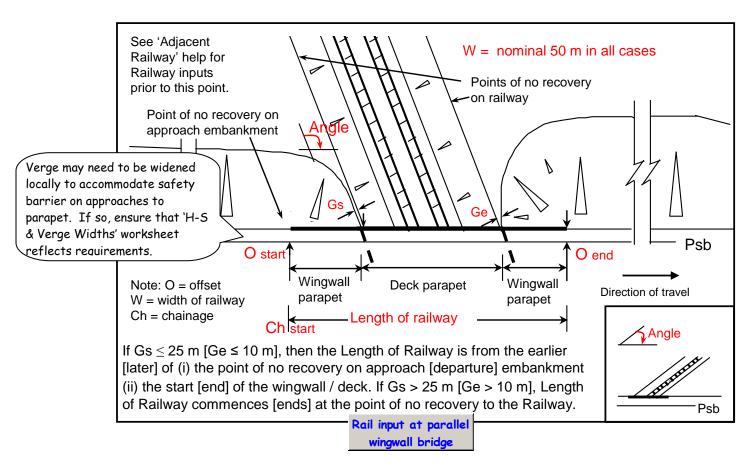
(d) Railway crossing under Road at structure with parallel wingwalls
